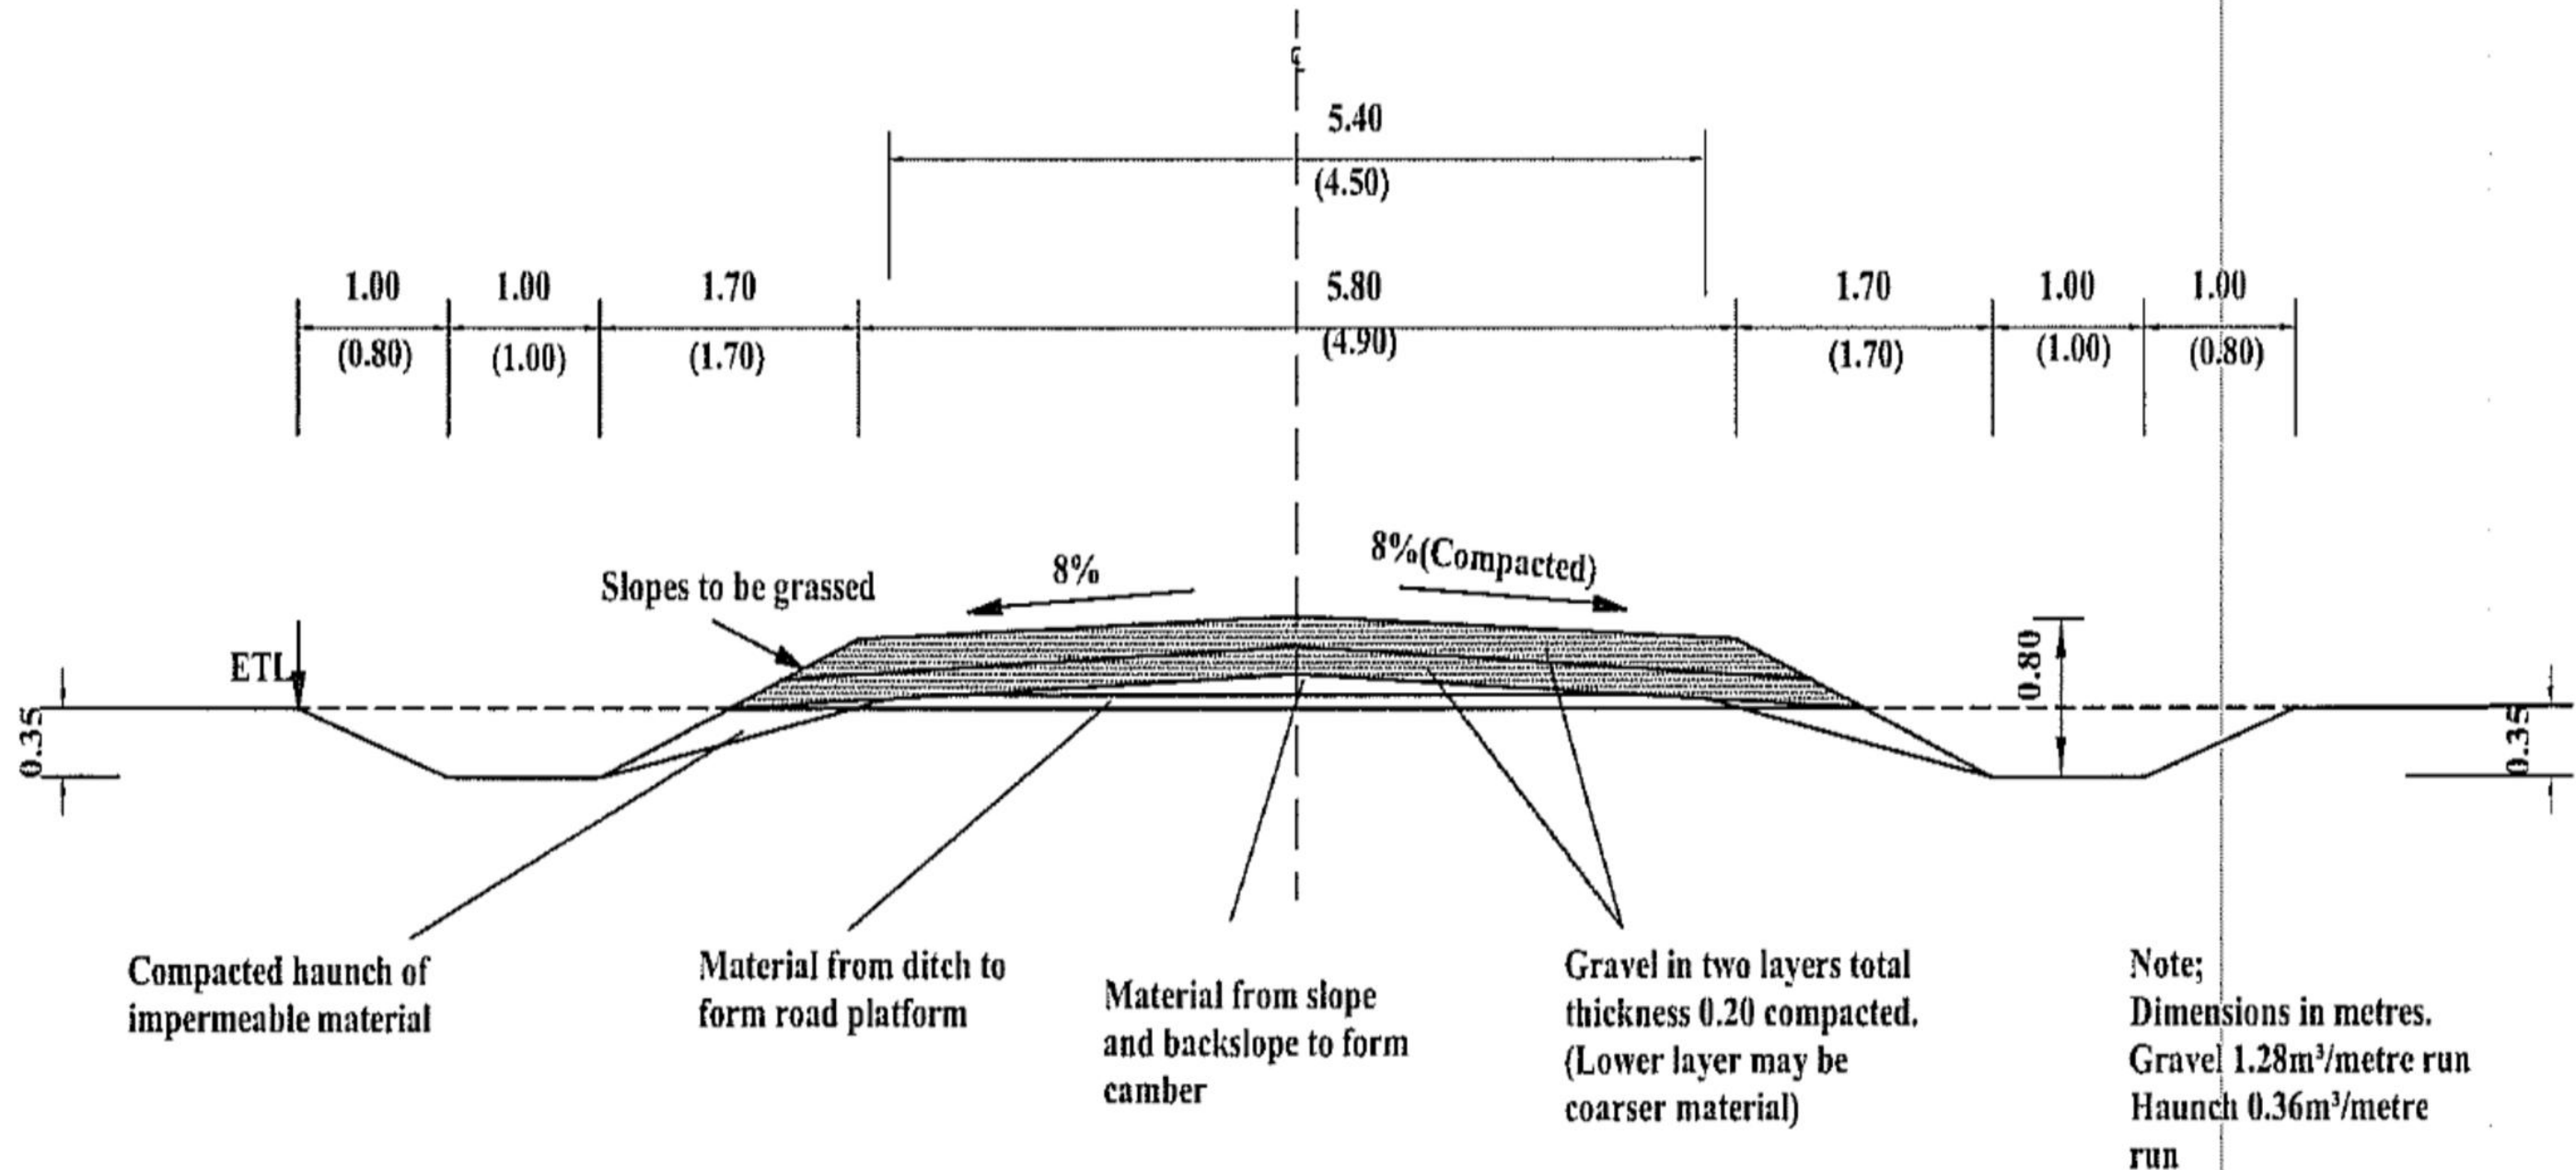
CROSS SECTION B (REDUCED CROSS-SECTION)
